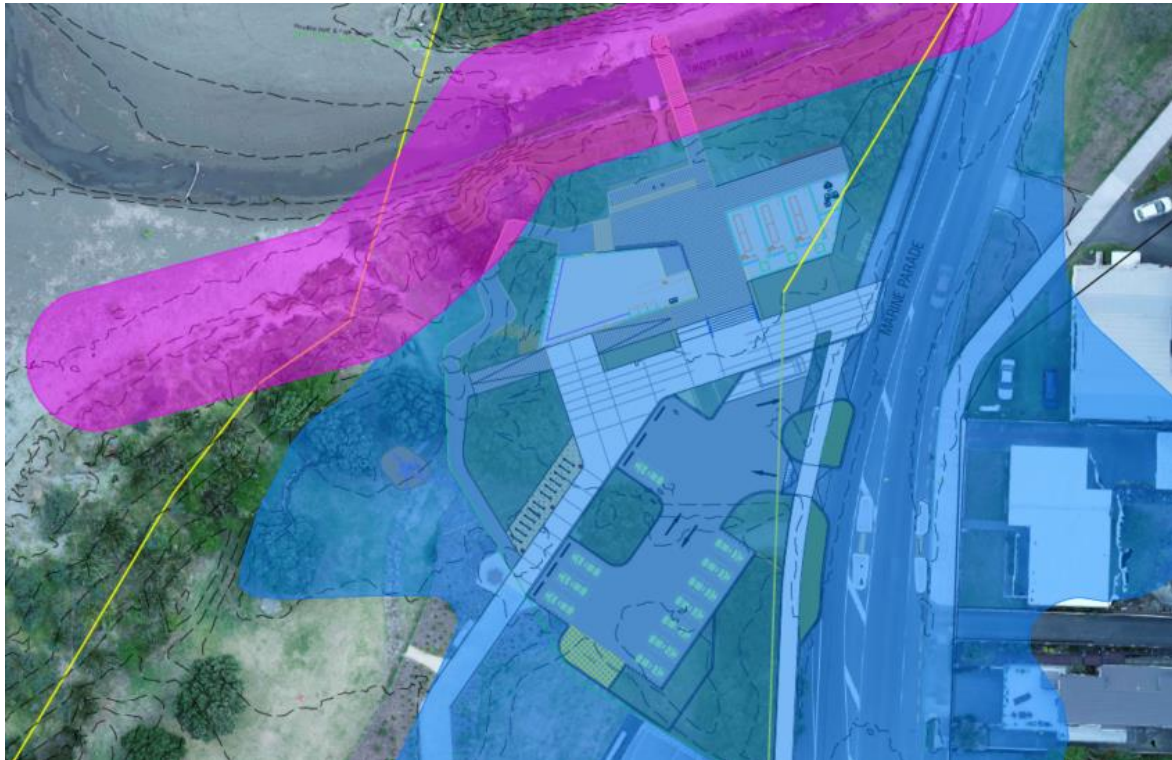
Te Uruhi Layout Plan with Operative District Plan zoning overlaid; Natural Open Space (green) and General Residential (yellow).
